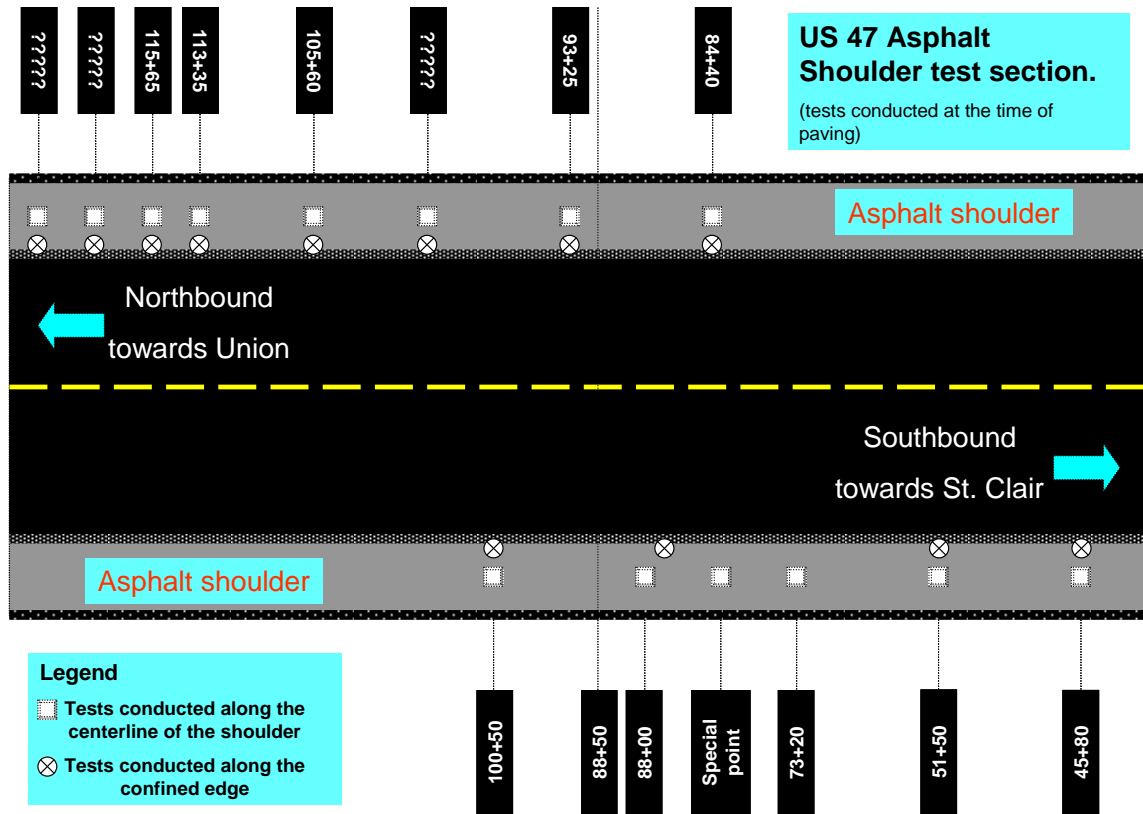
Layout of Test Points on the Shoulder Paved on US-47, Missouri
